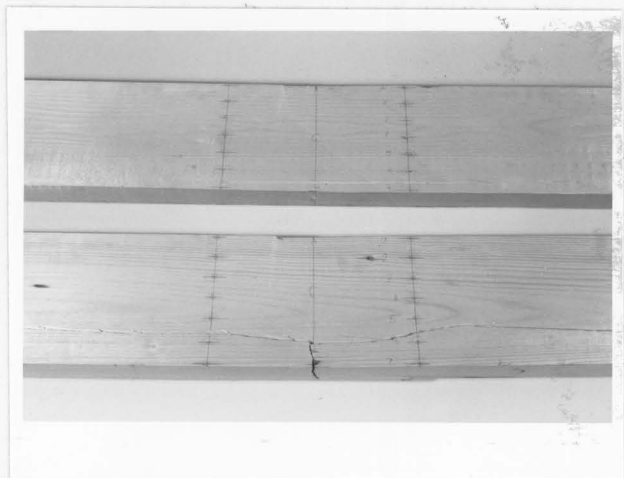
TYPICAL FAILURE IN 2 x 8 CLEAR BEAMS SUBJECTED TO CENTRAL LOADING
